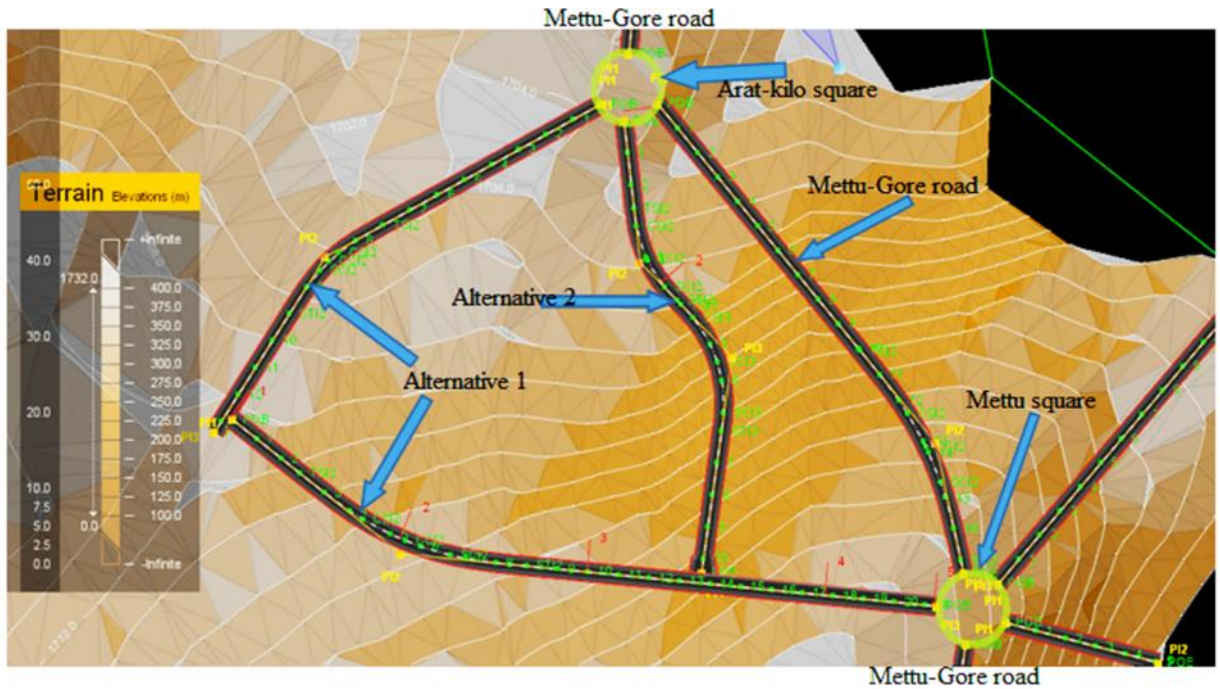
Horizontal alignment drawings for the selected alternative roads at “Arat-kilo”
